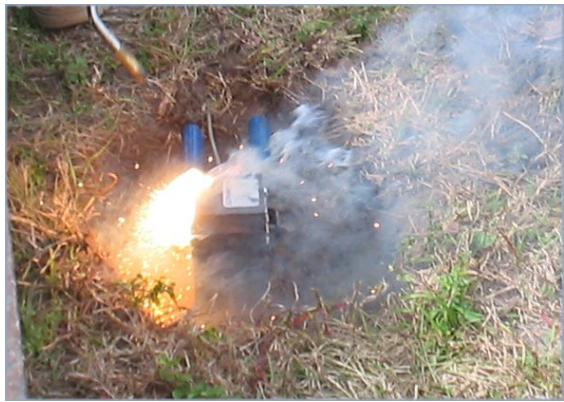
Examples of Typical Exothermic Welds
